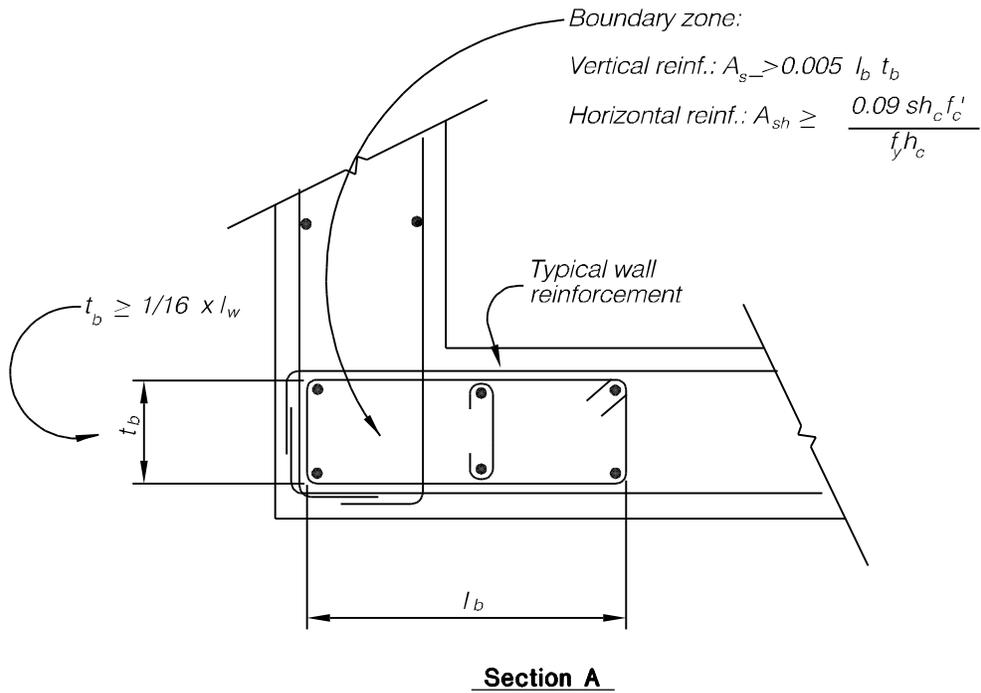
cont. Boundary zones in a special reinforced concrete shear wall
